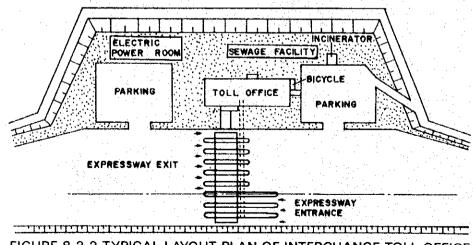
TYPICAL LAYOUT PLAN OF INTERCHANGE TOLL OFFICE
